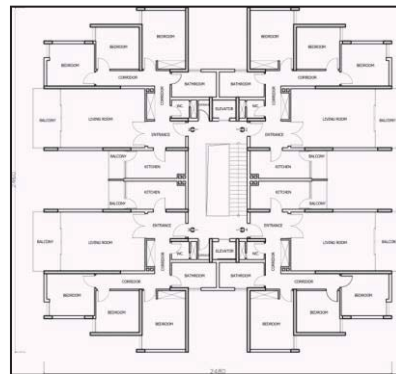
Floor plan layout of E (Source: İSDEMİR Archive, 2012 and revised by author)
